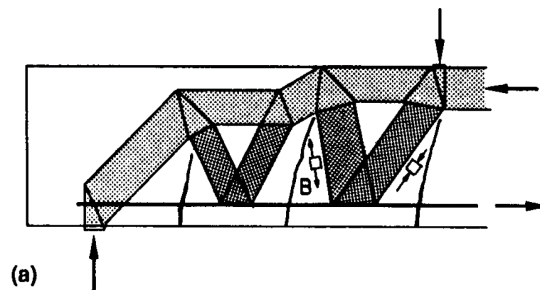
Critical shear crack theory – formation of struts and ties in the concrete after flexural cracking occurs. The top chord (shaded light grey) is concrete, the diagonals (shaded light and dark) are concrete and the bottom tie is the flexural steel reinforcement
